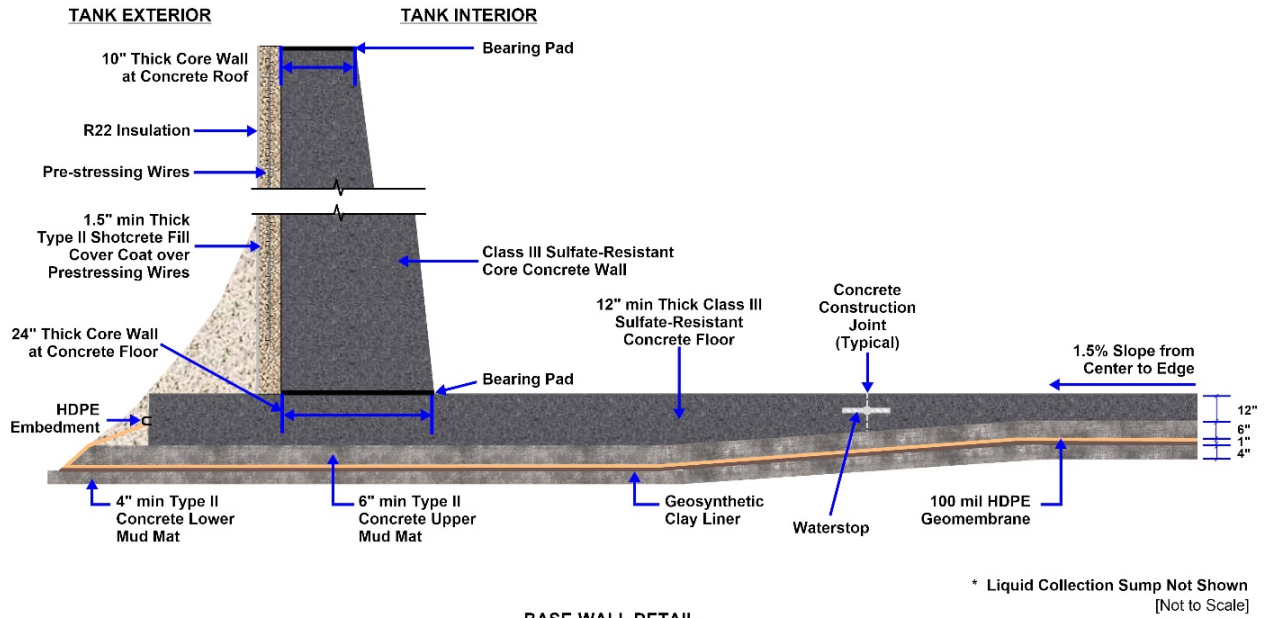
375-Foot Diameter SDU Wall Section Cast in Place
